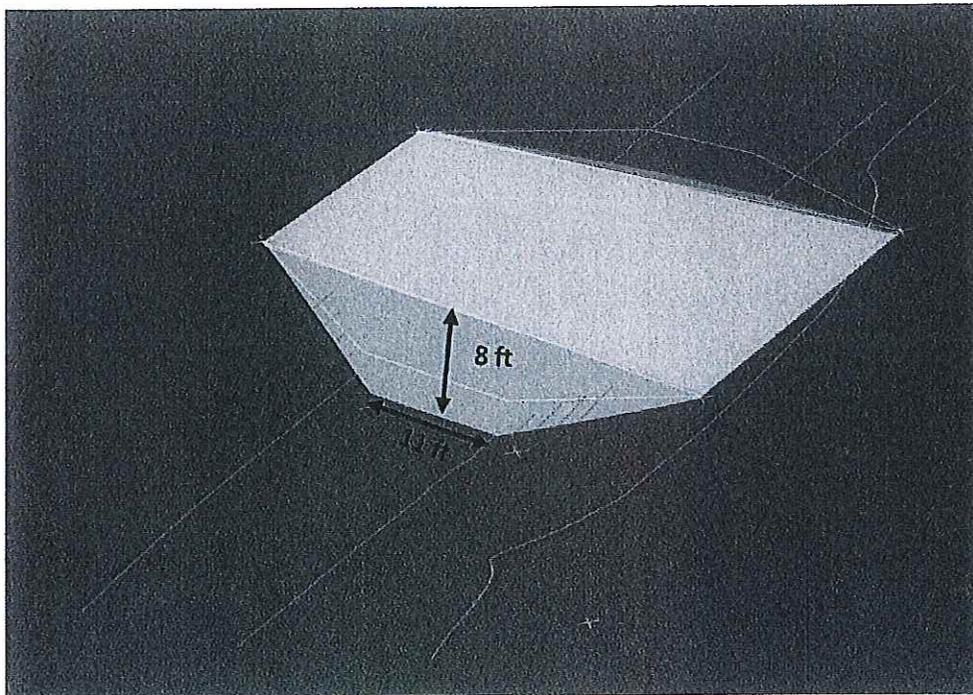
Cross Section – Downstream Pentolite Ditch Cofferdam
